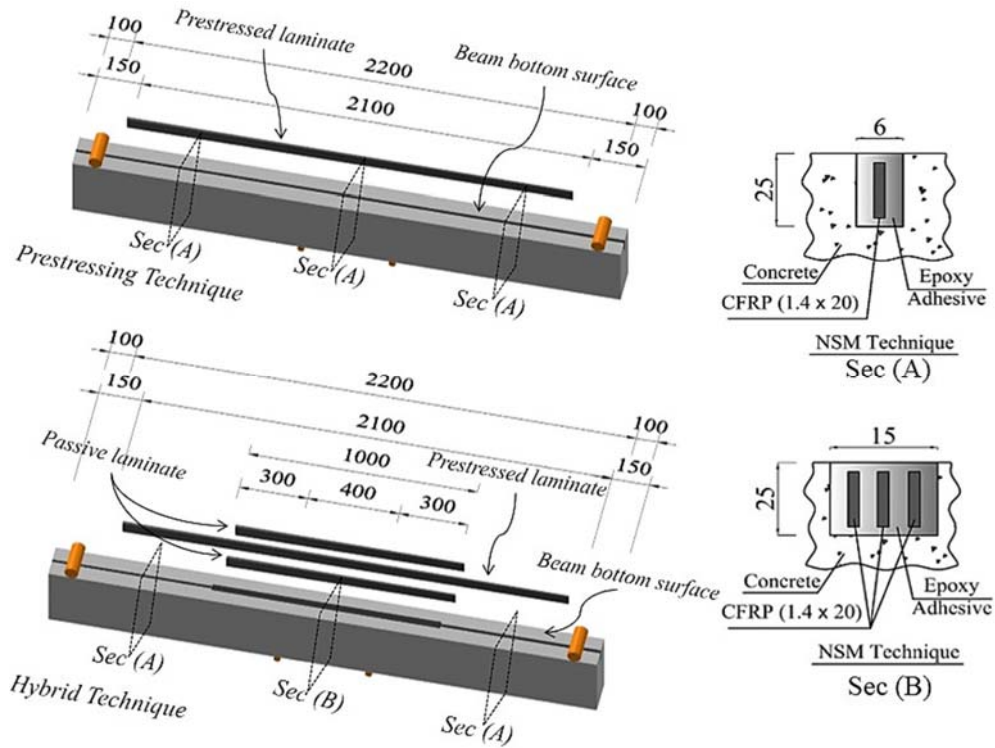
CFRP reinforcement details of hybrid and prestressing NSM techniques (dimensions in mm)
